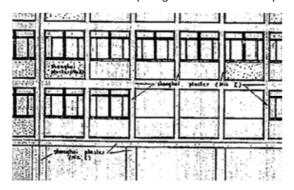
A detail of a plan showing the use of Shanghai Plaster on the buildings (ASD, 24213)
